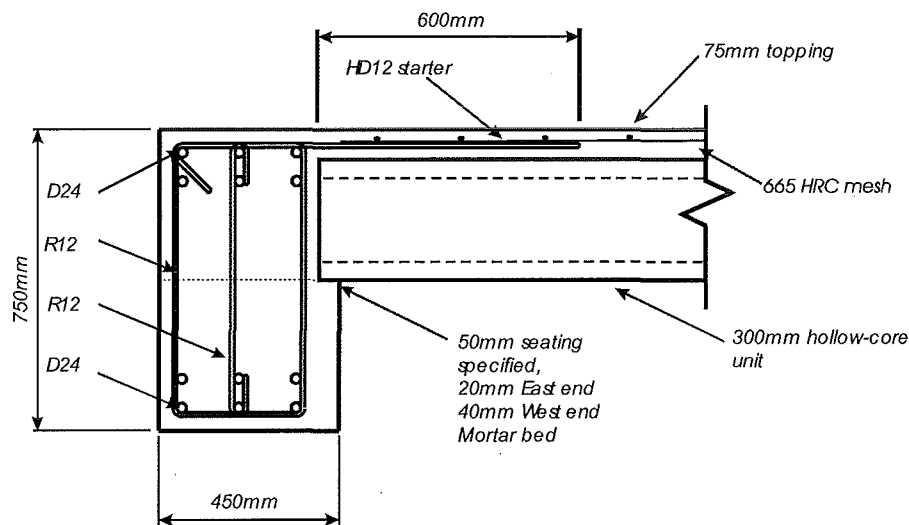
The connection detail used to connect the hollow-core units to its supporting beam.
